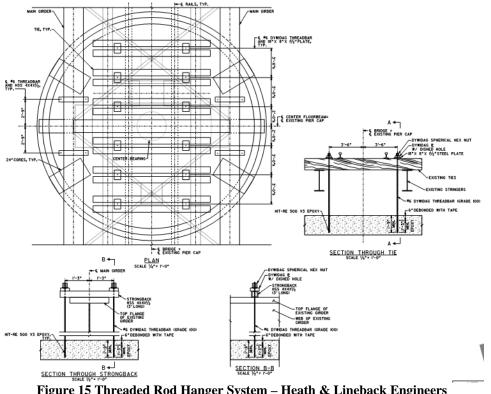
Threaded Rod Hanger System – Heath & Lineback Engineers
